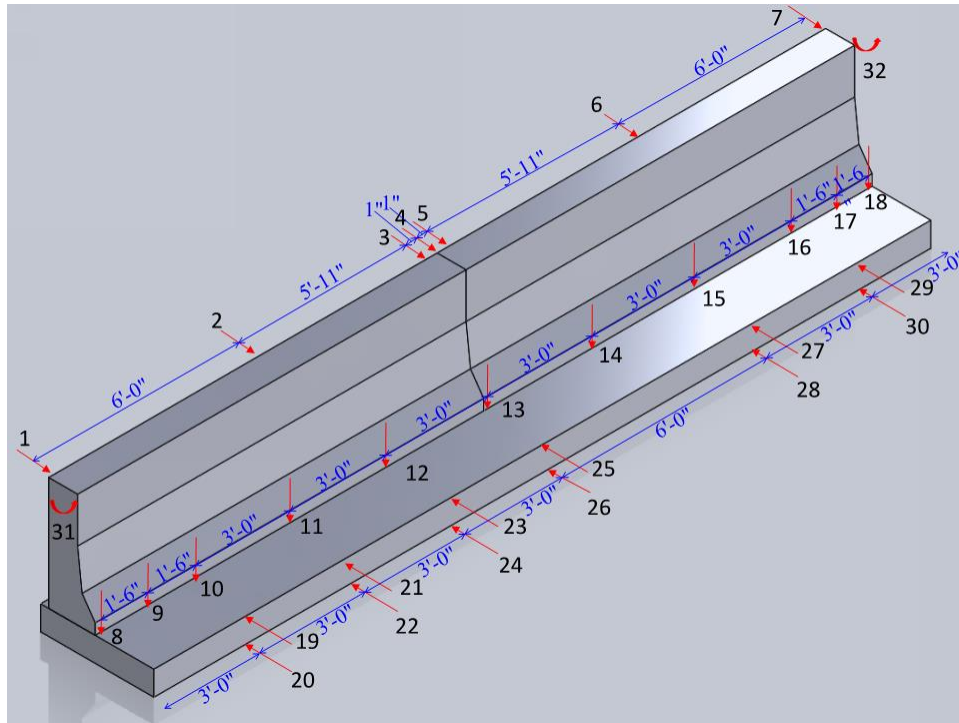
Location of strain gauges in barrier connection reinforcement and top deck reinforcement
